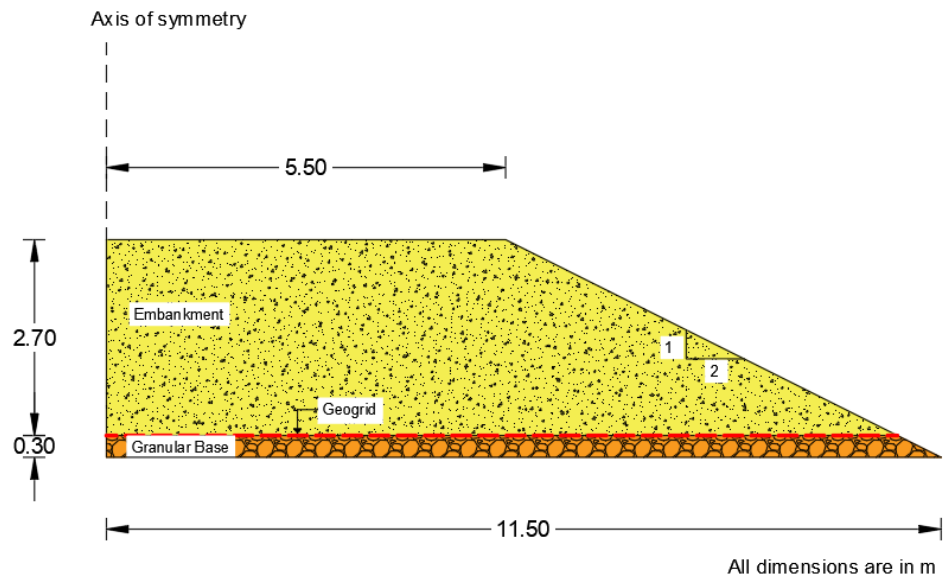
Cross-section of the geogrid-reinforced embankment.
